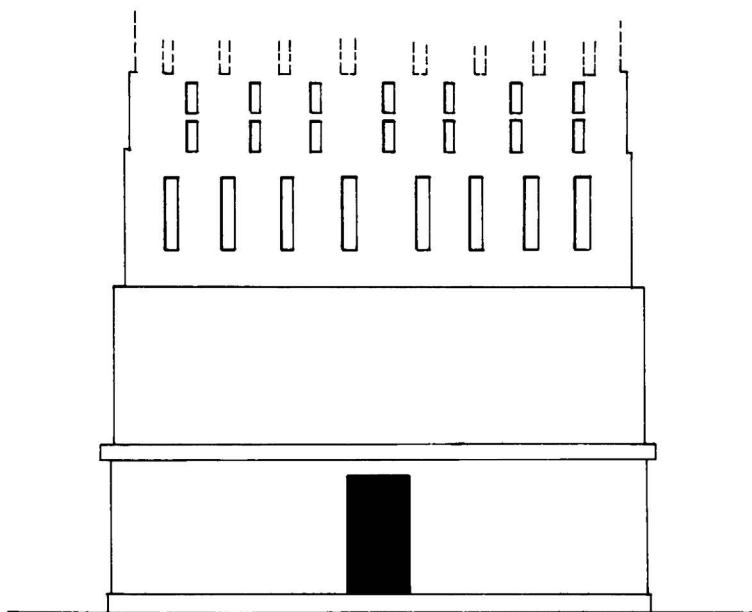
Structure 2. Main facade showing upper wall zone and roofcomb. (after Case, 1911)
